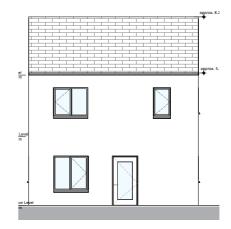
3-Bed Unit Rear Elevation (not to scale)
